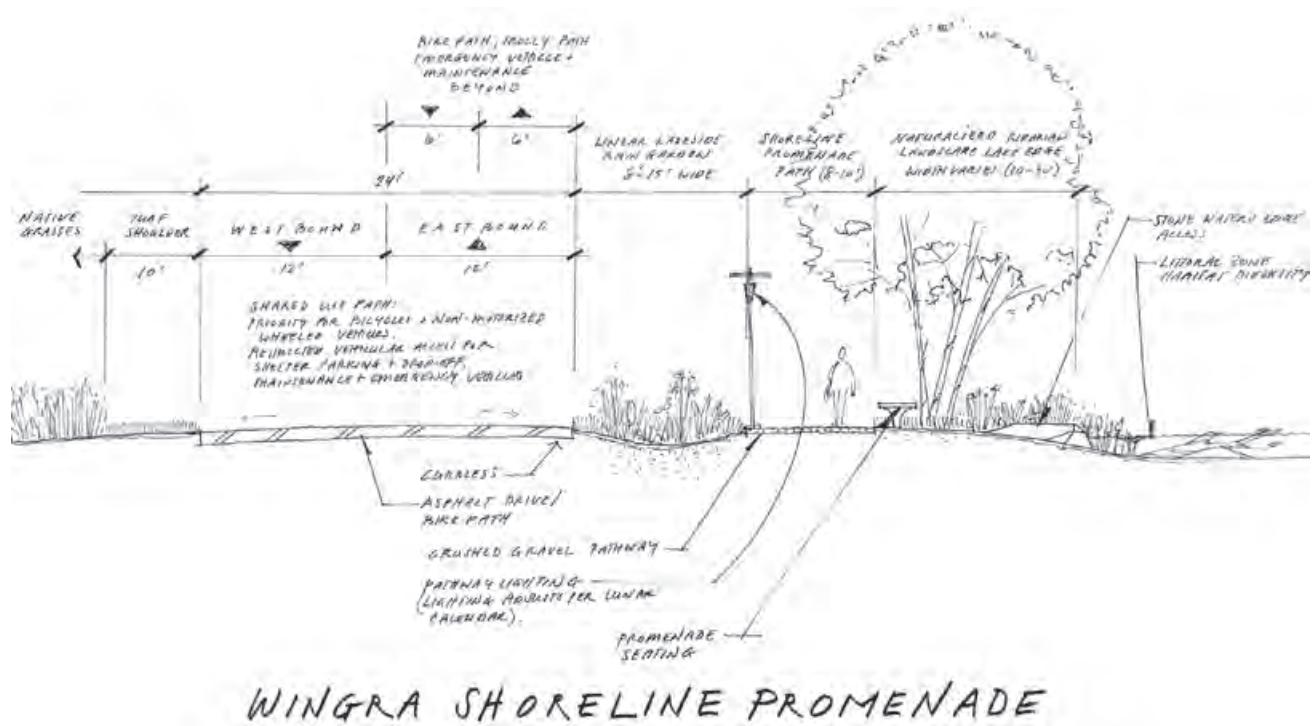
Vilas Park and Lake Wingra Shoreline Vision Plan - Cross Section of Vilas Park Drive (Lauren Brown 2012)
